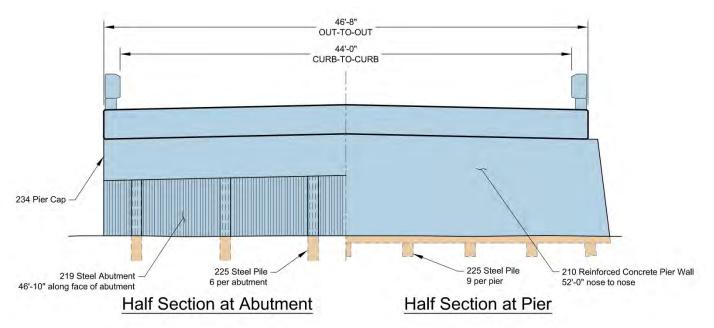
EI.24.3-3: Cross section view of continuous concrete slab superstructure
